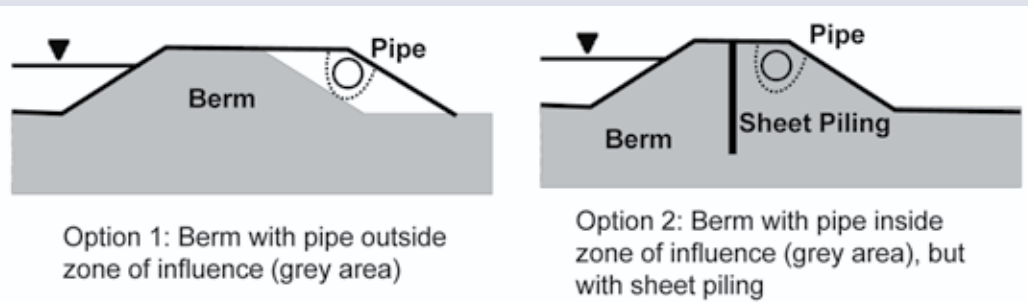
Possible levee reinforcements to accommodate a pipe
